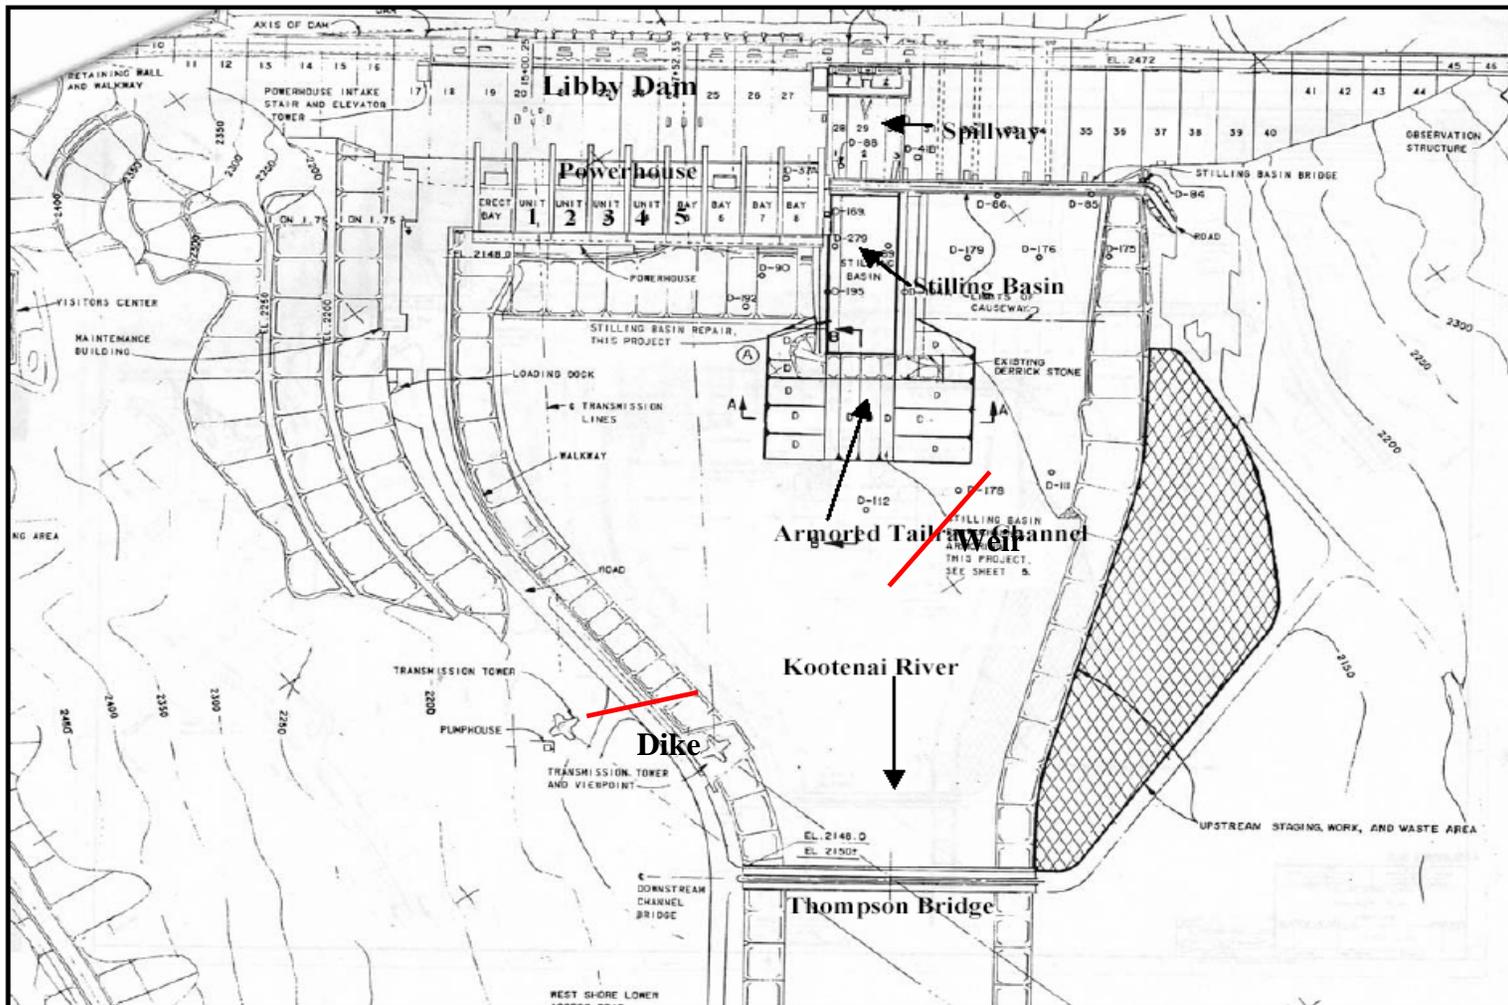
Libby Dam Tailwater Mixing Structure, Alternative 4
